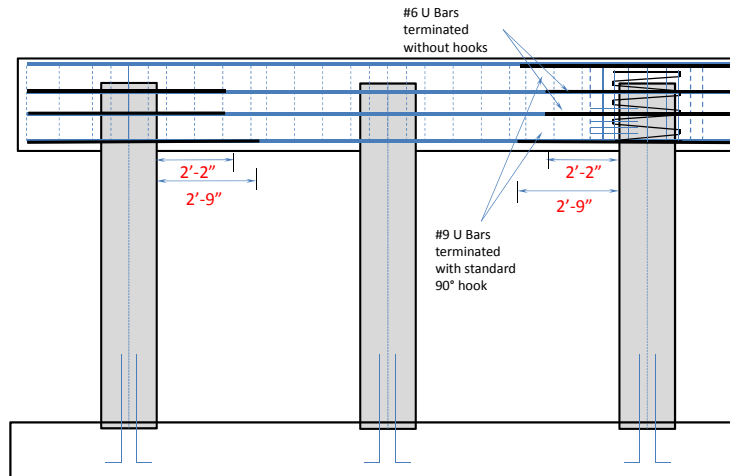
Longitudinal Reinforcement - Three Pile Specimen
